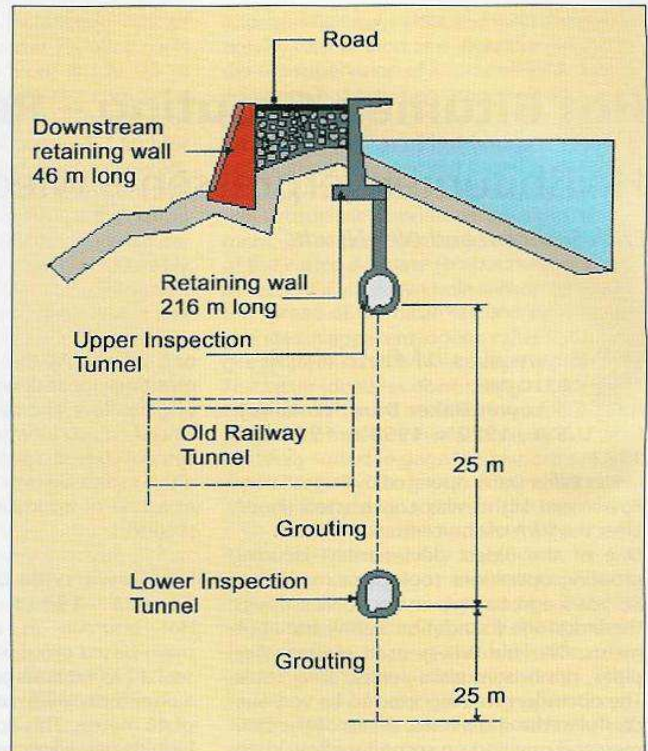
Plan view of dam and inspection tunnels (Schönian [5])
